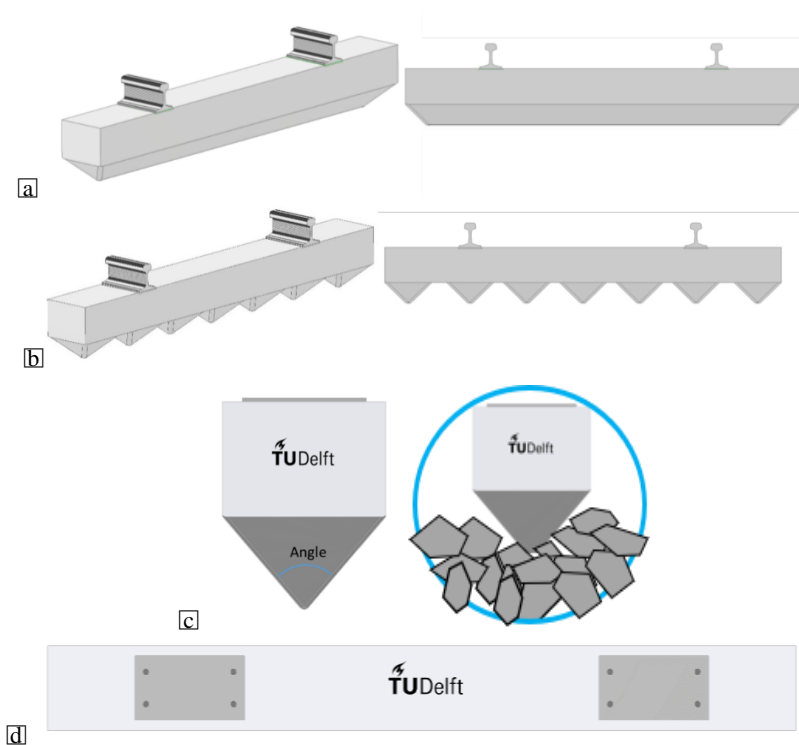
Wedge-sleeper designs. (a) Single wedge design, (b) Multi-wedge design, (c) Side-view of both designs, (d) Top-view of both designs
